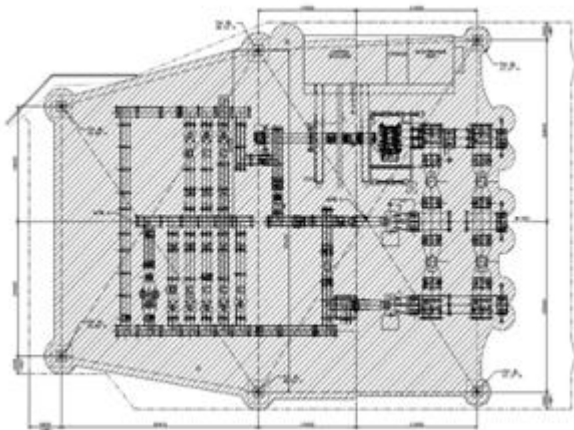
Substation plan view with protection angle lightning protection scheme. Reference: Case Study [1]
